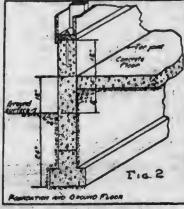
Showing a Good Method of Making Foundation and Floor of a New Building Ratproof.
